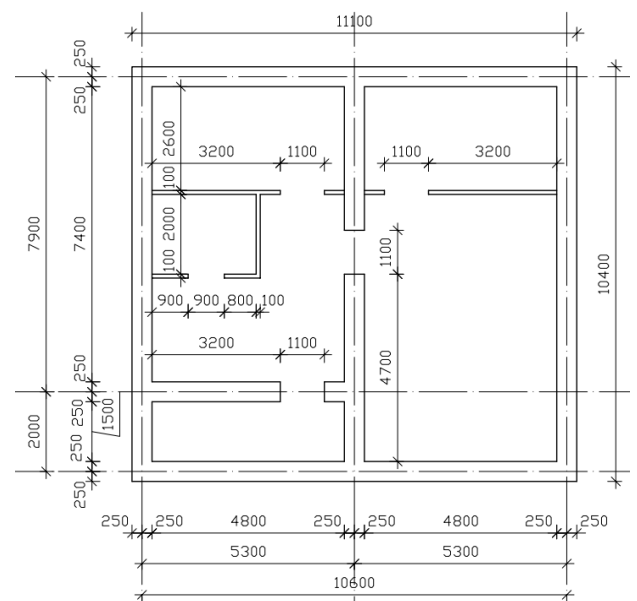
Plan of the basement under the existing 1-story kindergarten old building with stone bearing walls.
